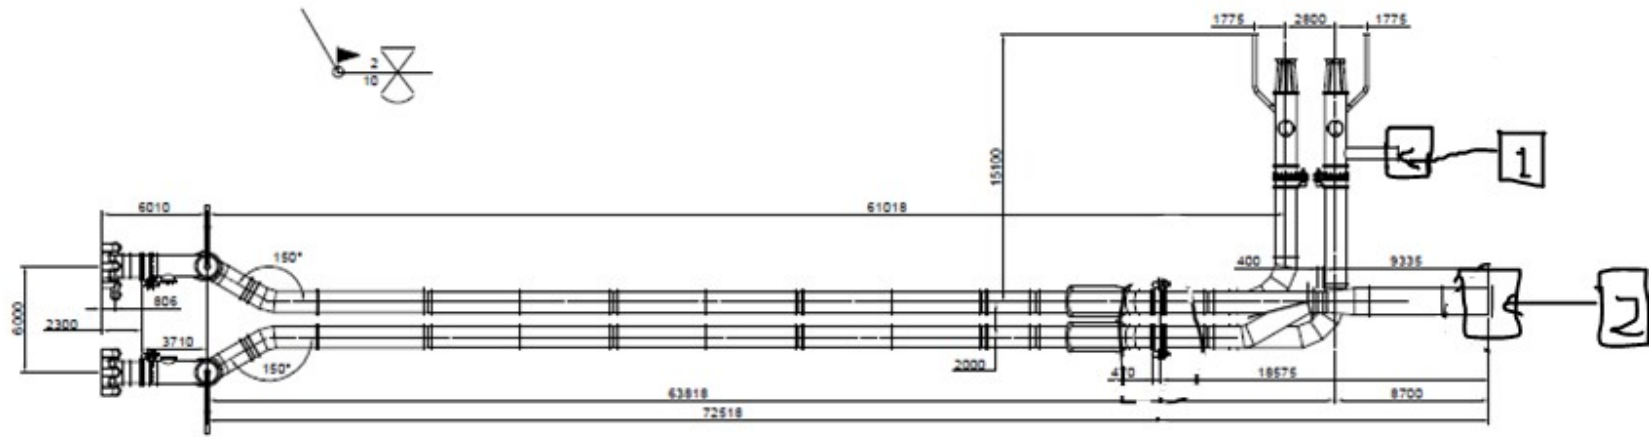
Top view of Metolong Dam intake pipes' horizontal arms (Source: Metolong dam safety department).
